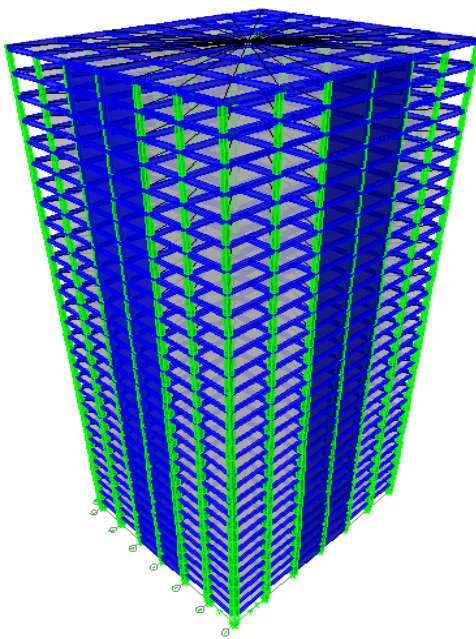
6: Elevation of the Concrete Framed Model of the Building braced with four storeys module diagrid
